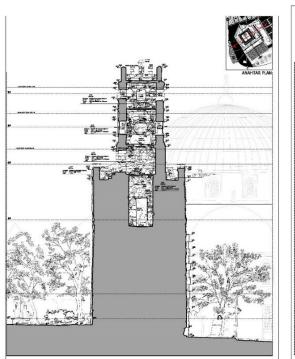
Clock Tower +8.00, +12.50, +15.50, and +18.20 elevation plans.
